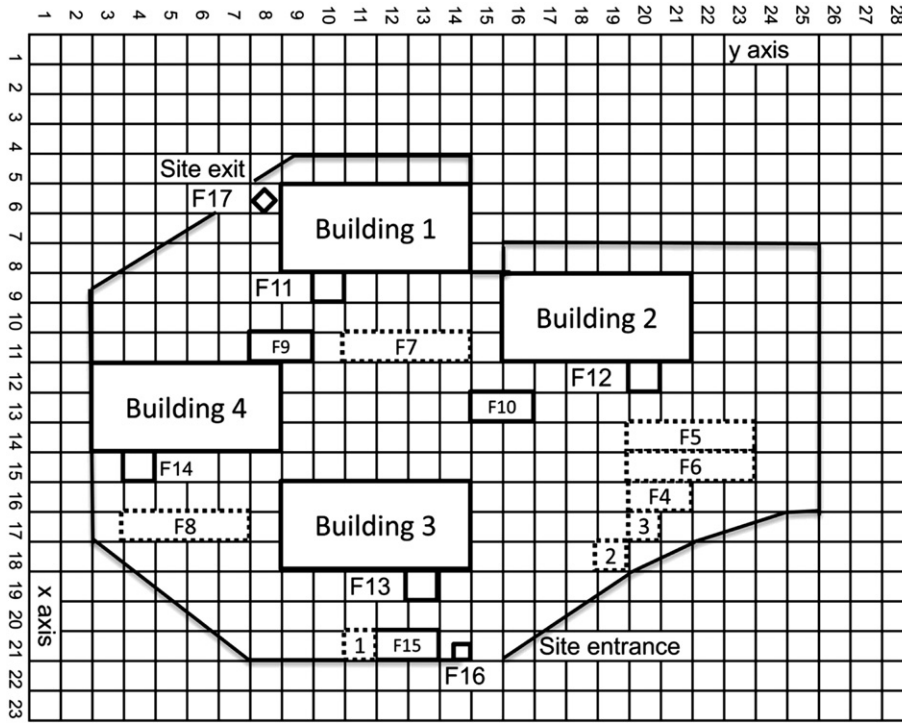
Original construction site layout prepared by the contractor for design example 1.
